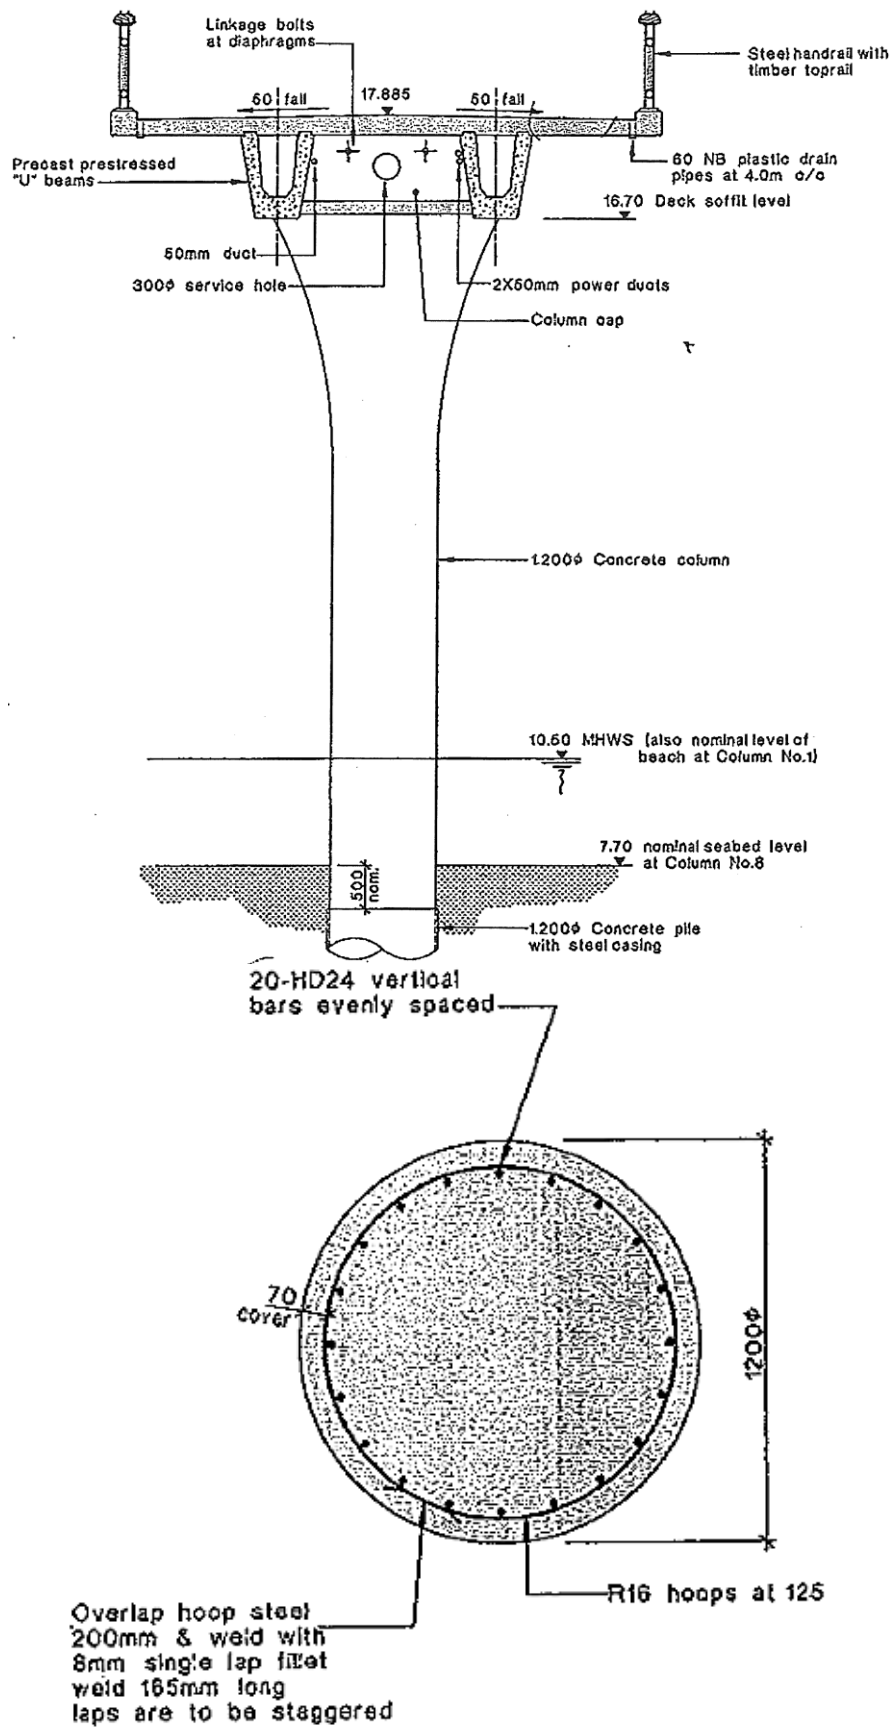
Top: Standard column layout with deck section atop; Bottom: Column section at soil interface (CCC 1995).
